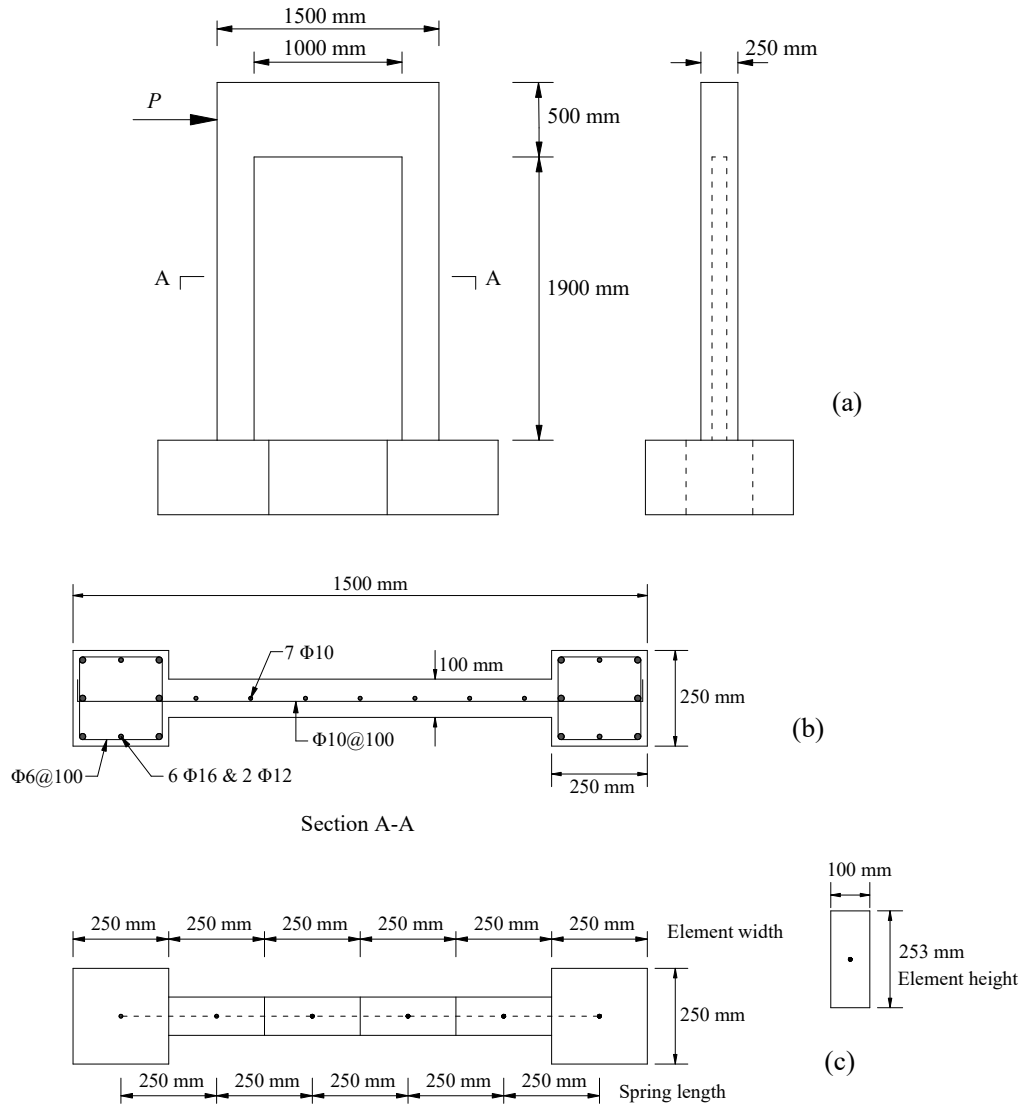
Wall specimen W2 tested by Sittipunt et al. (2001)
